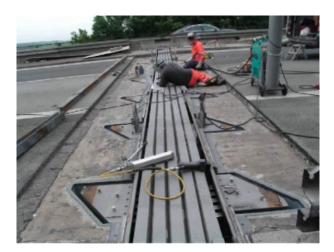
Welding of the new expansion joint into the old structure
